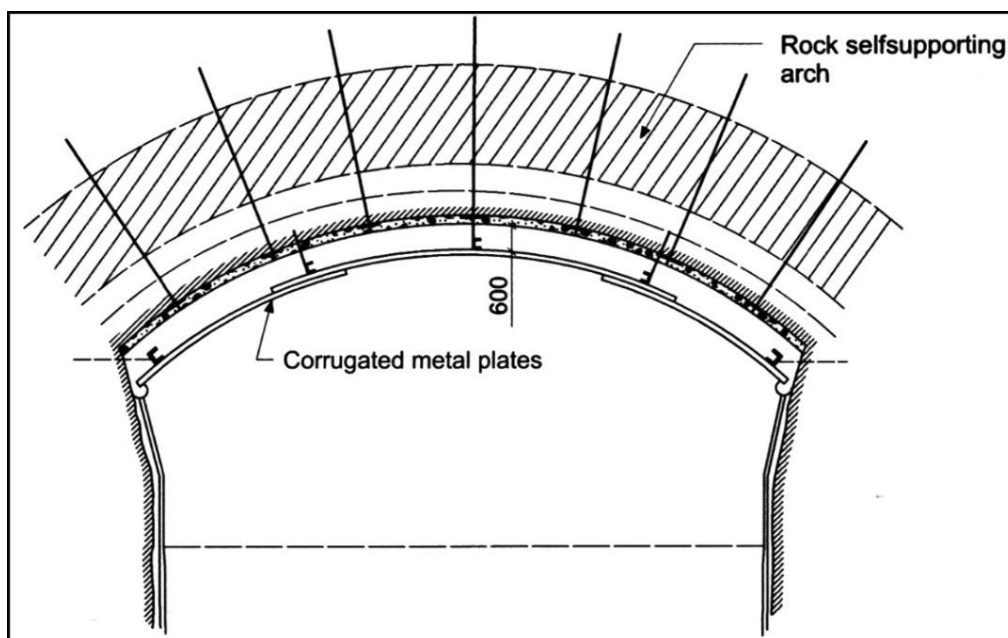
5 Typical SFRS arch with suspended light ceiling for collection of water seepage
